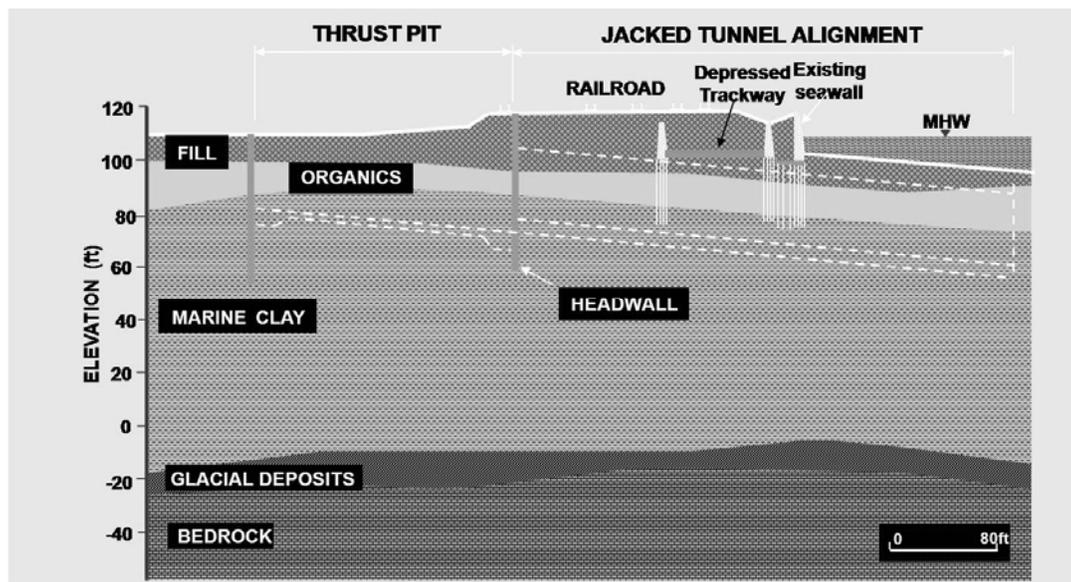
Generalized Subsurface Profile for the I-90 Jacked Box Tunnels
